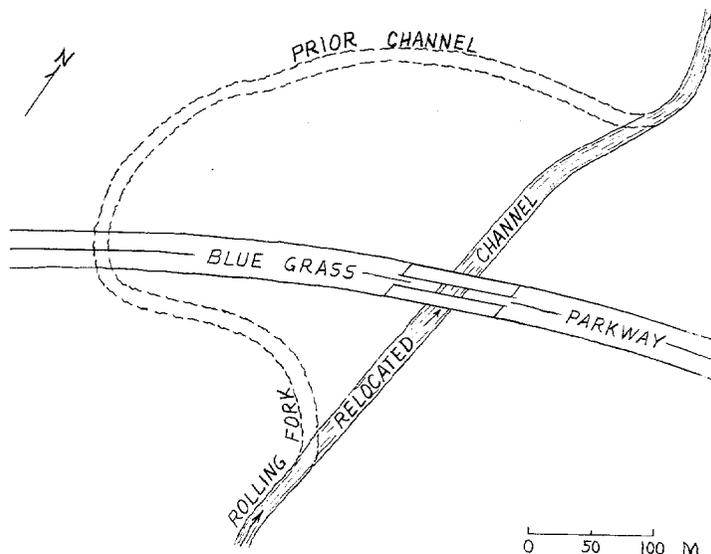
Plan sketch of channel relocation, Rolling Fork at Blue Grass Parkway.
